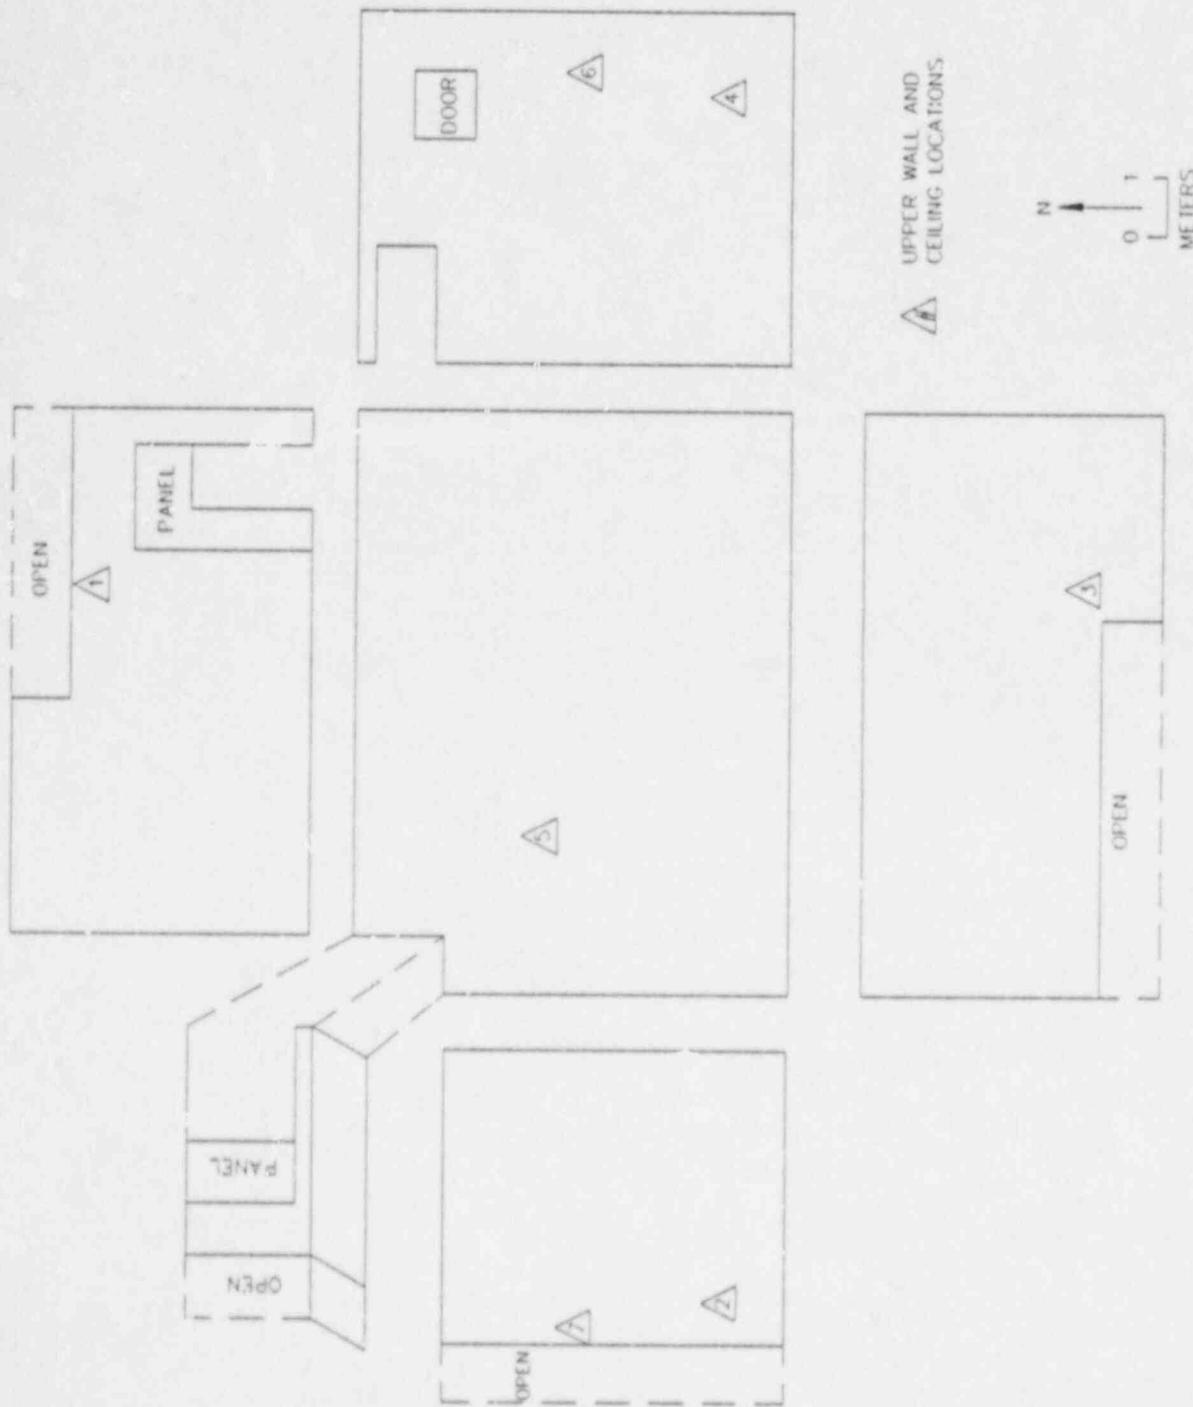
Room 19 Showing Locations of Upper Wall and Ceiling Single-point Measurements
